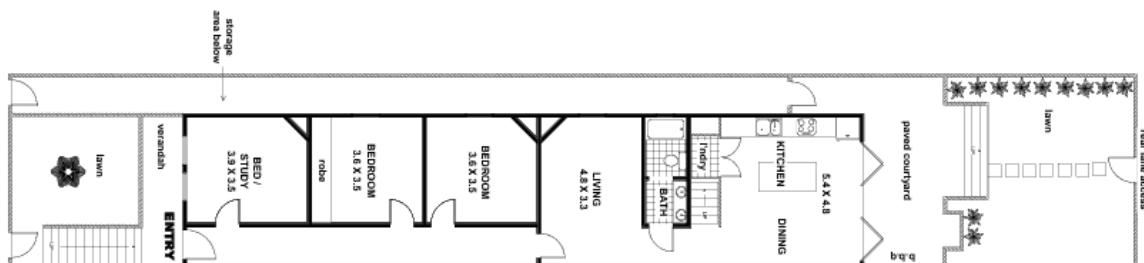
Floor plan of 12 Ourimbah Road, Mosman. (Source: <https://www.realestate.com.au/property/12-ourimbah-rd-mosman-nsw-2088/>)
